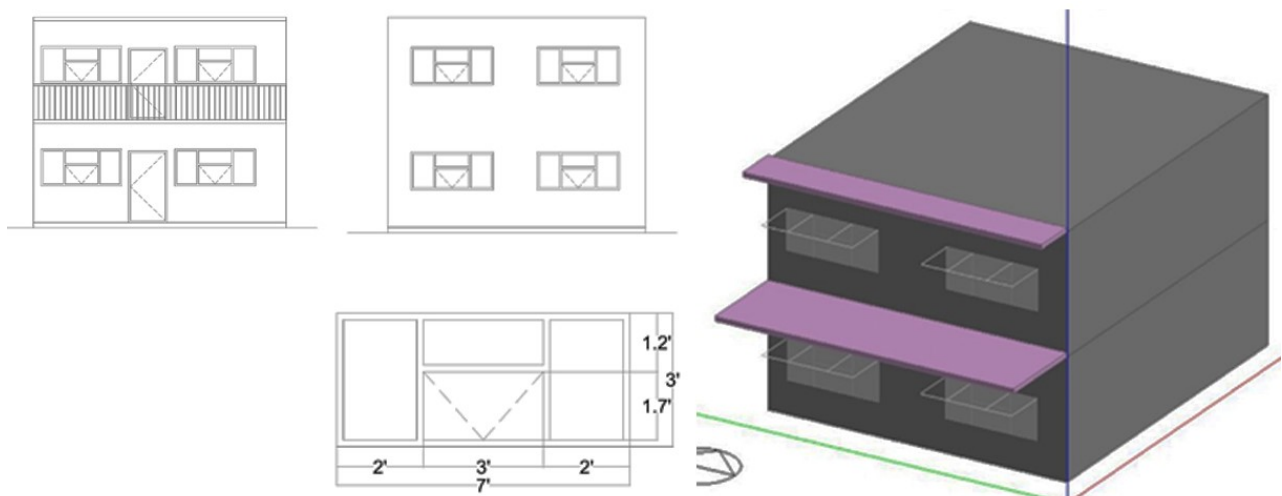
Details for WWR 20% model L-R: Front Elevation, Rear Elevation (Top), Window Detail (Bottom), and 3D design builder model, refer to Appendix A - for detail and clear drawings
